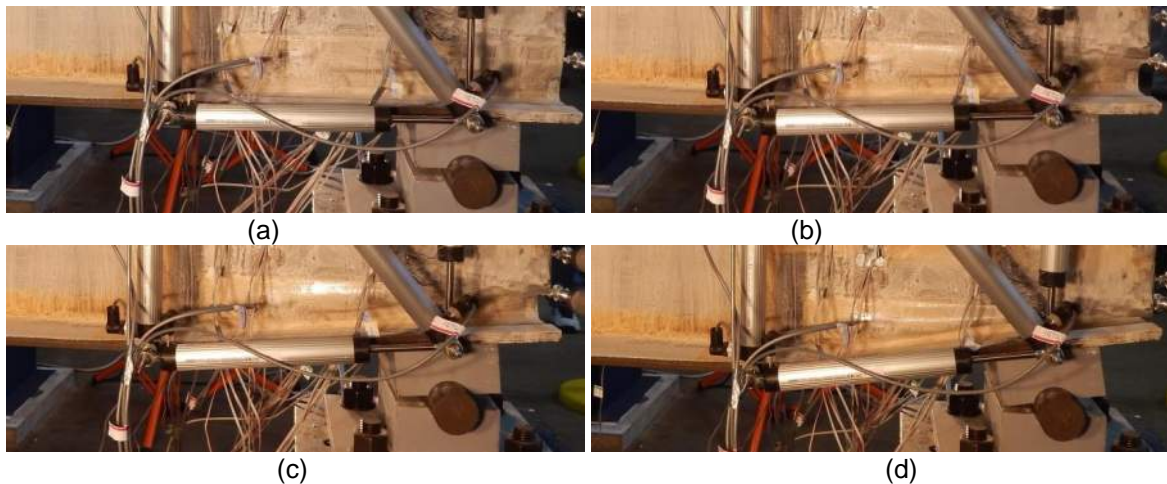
Whitewash Damage Progression in the Damaged Girder
